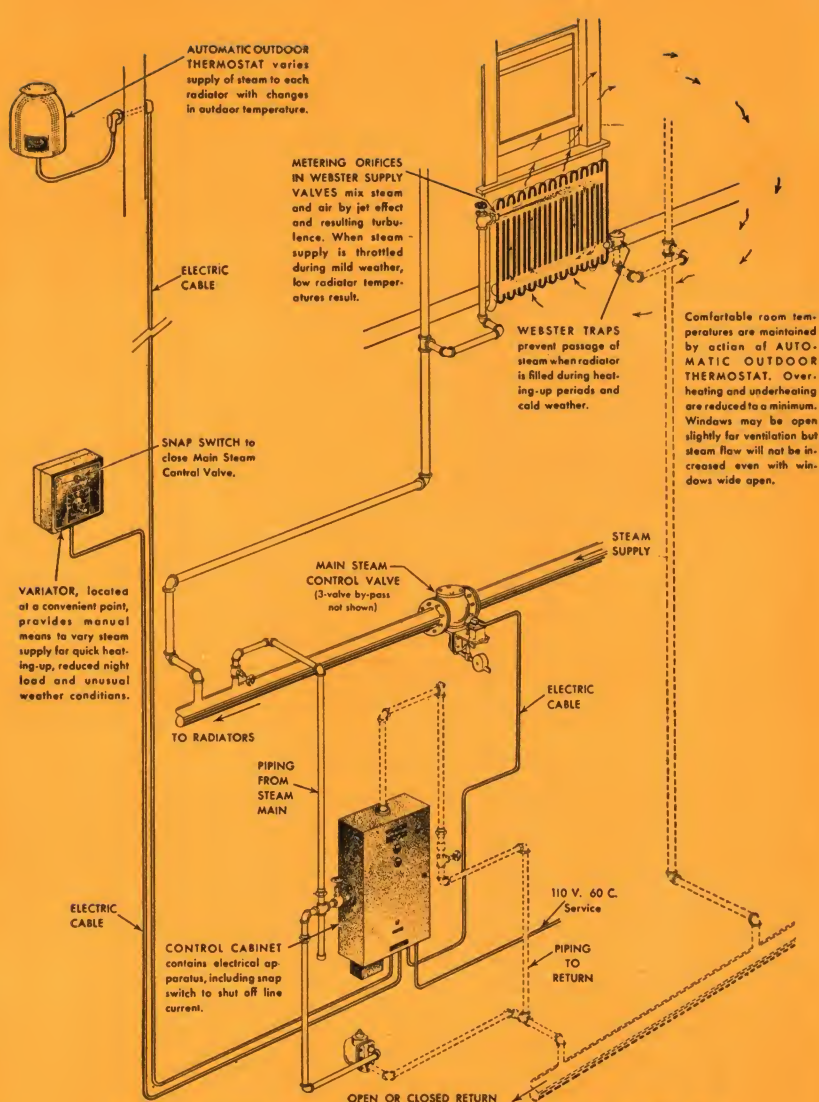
Standard Arrangement of Improved Webster System with Webster Type E-3 Electric Moderator Control, Using a Single Main Steam Control Valve
